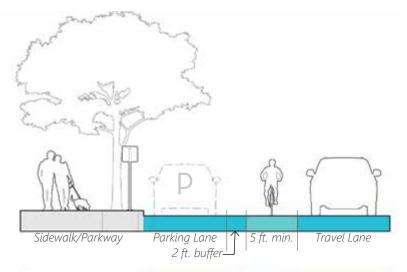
Typical Class II Bikeway, Non-Buffered, On-Street Parking Adjacent.
